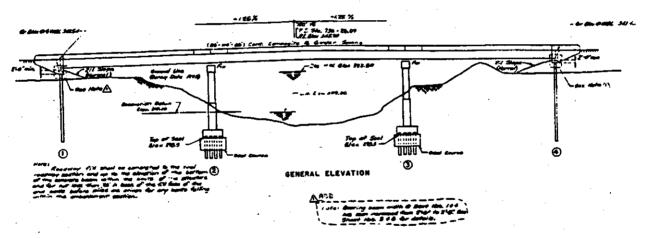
Bridge General Elevation (New St. Francis River Bridge)
